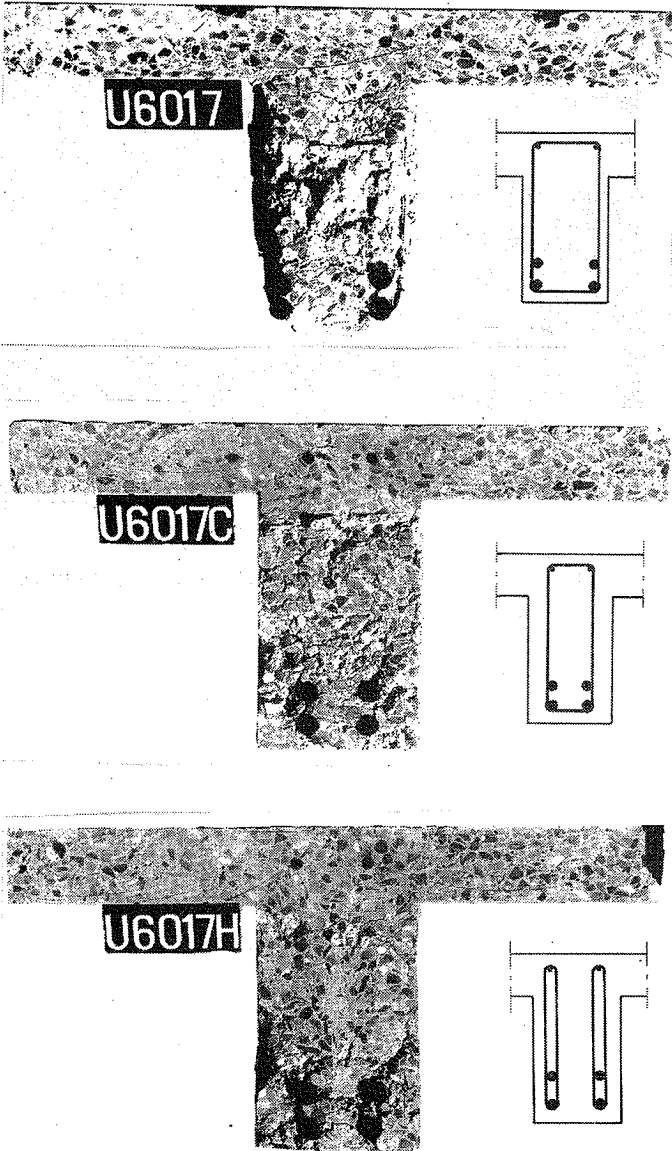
Normal sections of the beams U6017, U6017c and U6017h
